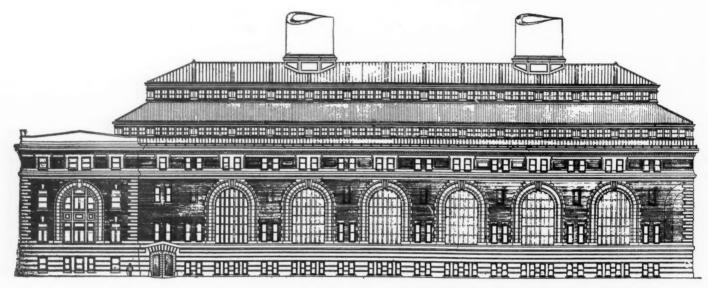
FIG. I.—SIDE ELEVATION OF POWER HOUSE
